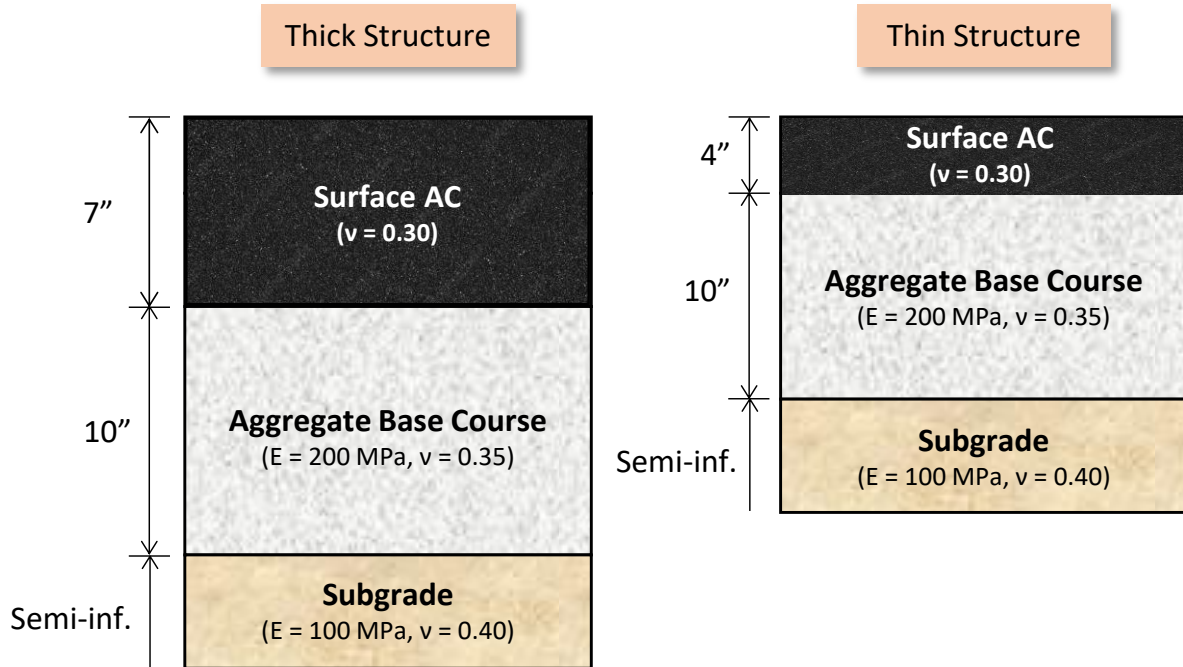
Pavement structures used for Pavement ME and FlexPAVE™ simulations.
